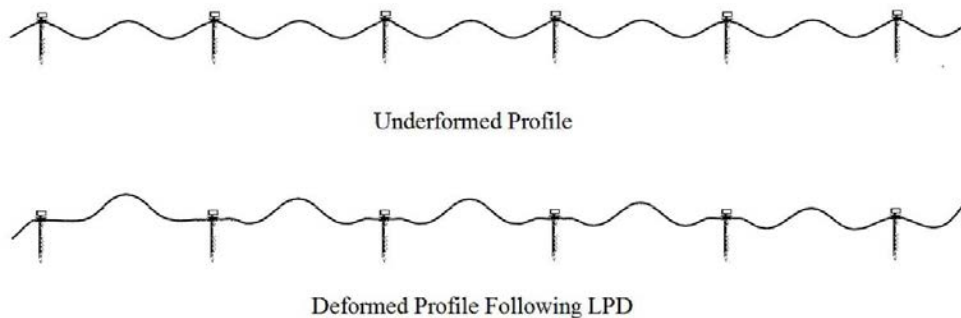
Corrugated cladding profile undeformed and following LPD
